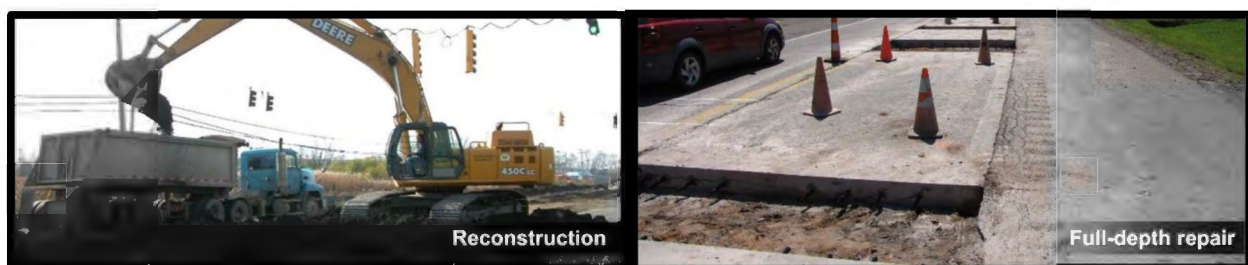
Examples of reconstruction treatments—(left) reconstructing a road and (right) road prepared for full-depth repair.
